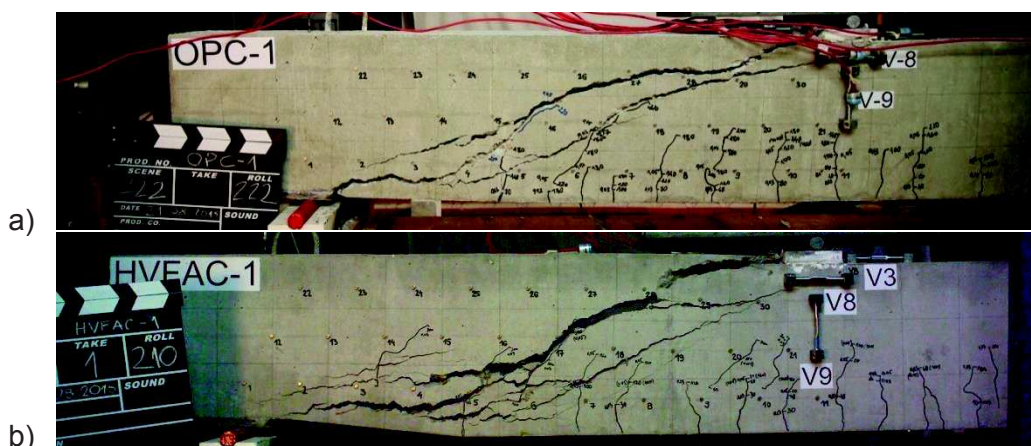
Failure of beams without shear reinforcement a) OPC-1, b) HVFAC-1
